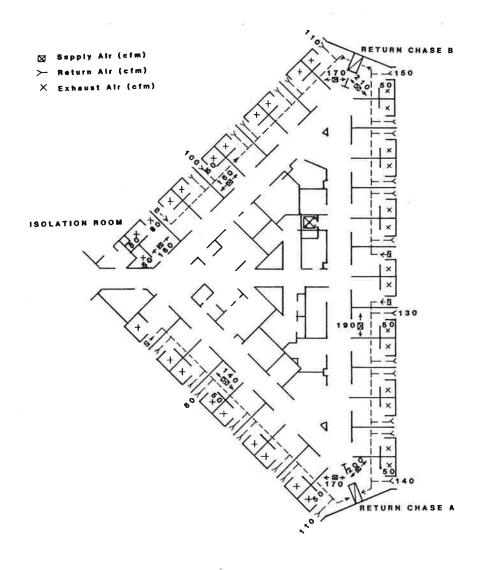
Typical room layout for patient tower 1 with supply, return, and exhaust air rates
